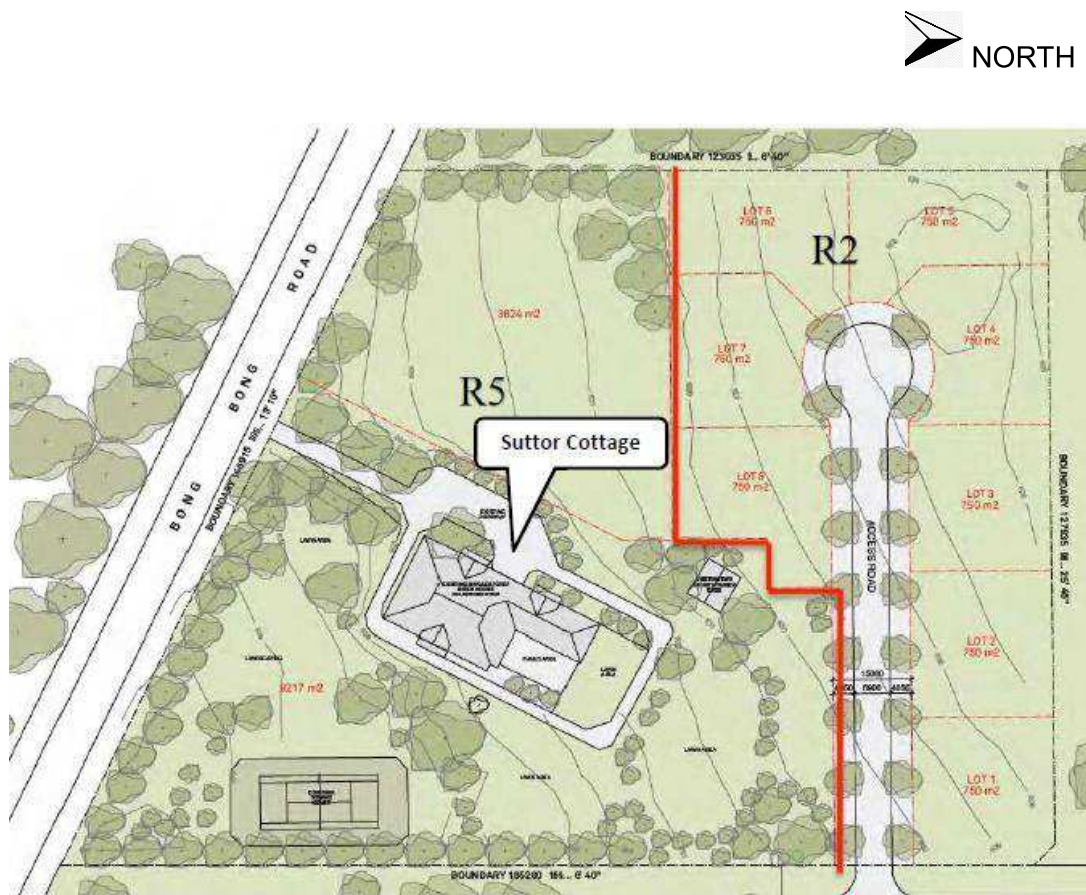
Draft Subdivision Plan (reproduced under separate cover as Attachment 8)
